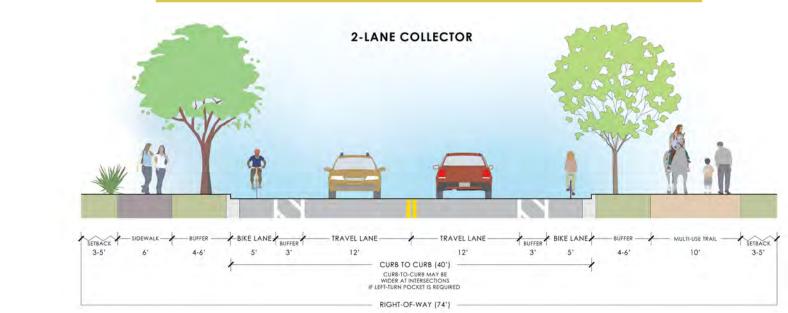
Typical Cross-Sections of Designated 2-Lane Collector Roadways, Part 4
